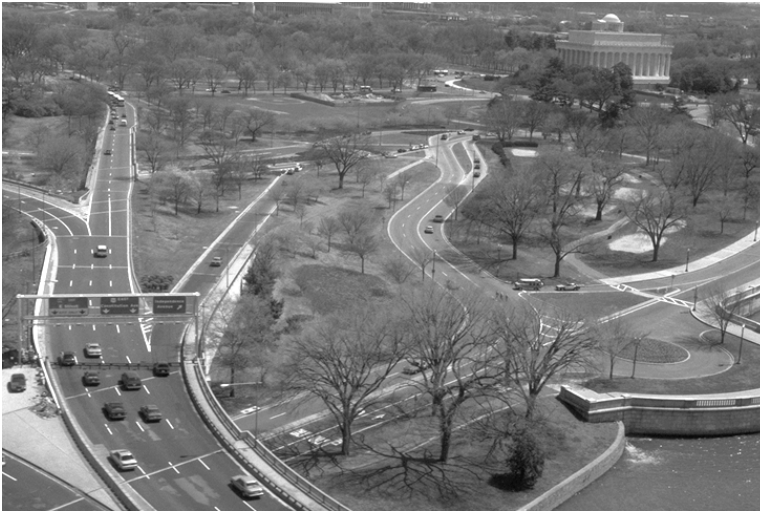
Aerial view of Roosevelt Bridge and its connection to Constitution Avenue and Ohio Drive, April 1996. MRC 3-27.
